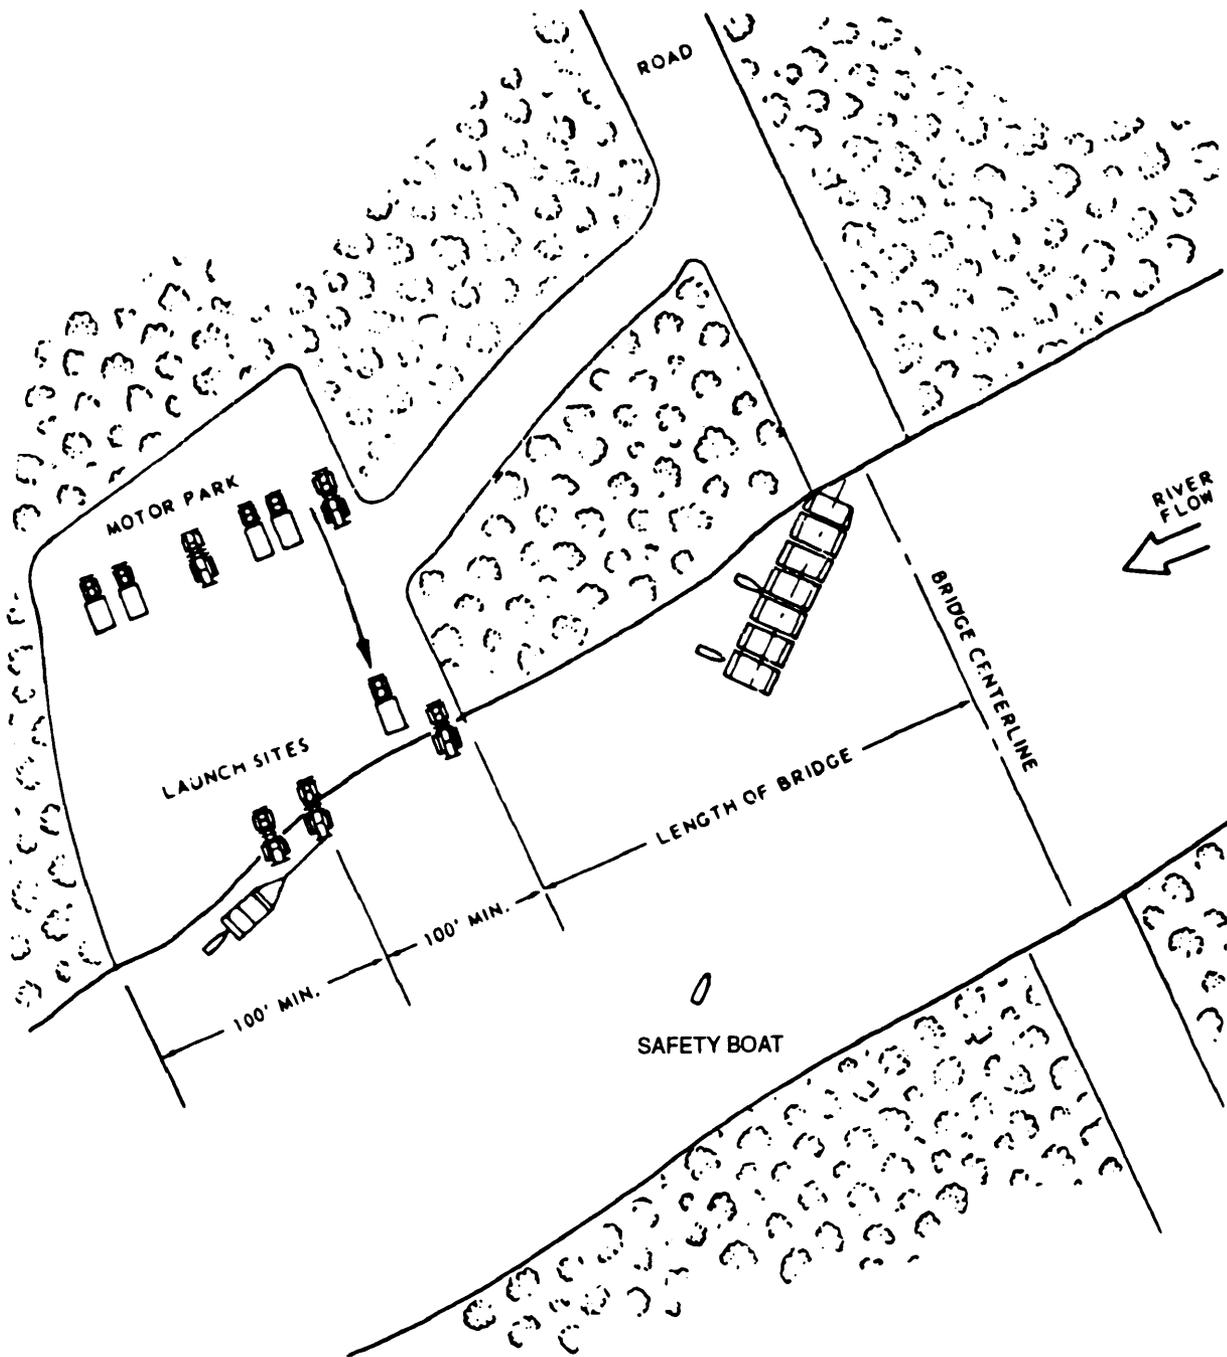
Bridge Assembly Site Layout for Multilaunch Site (Swinging Bridge Assembly).
